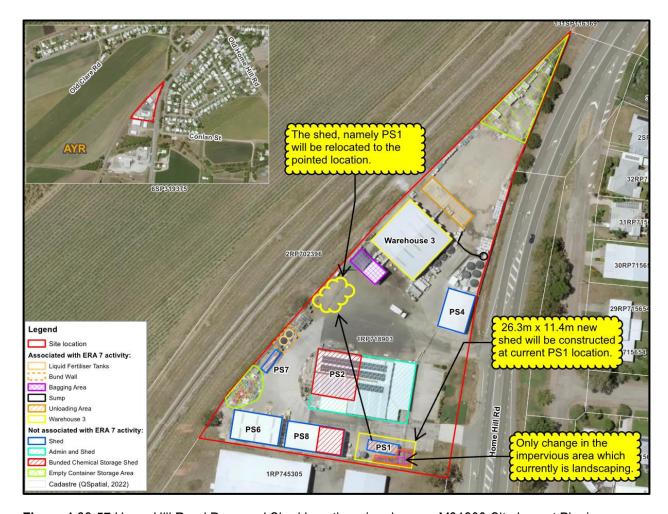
39-57 Home Hill Road Proposed Shed Locations (mark-up on M31800-Site Layout Plan)
